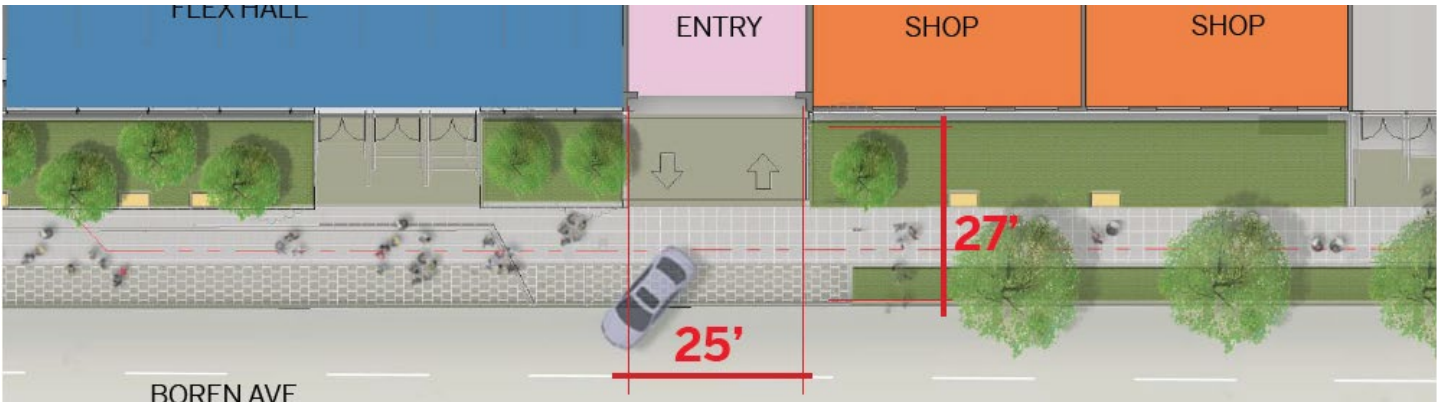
Proposed curb cut on Boren Ave for Convention Center expansion
